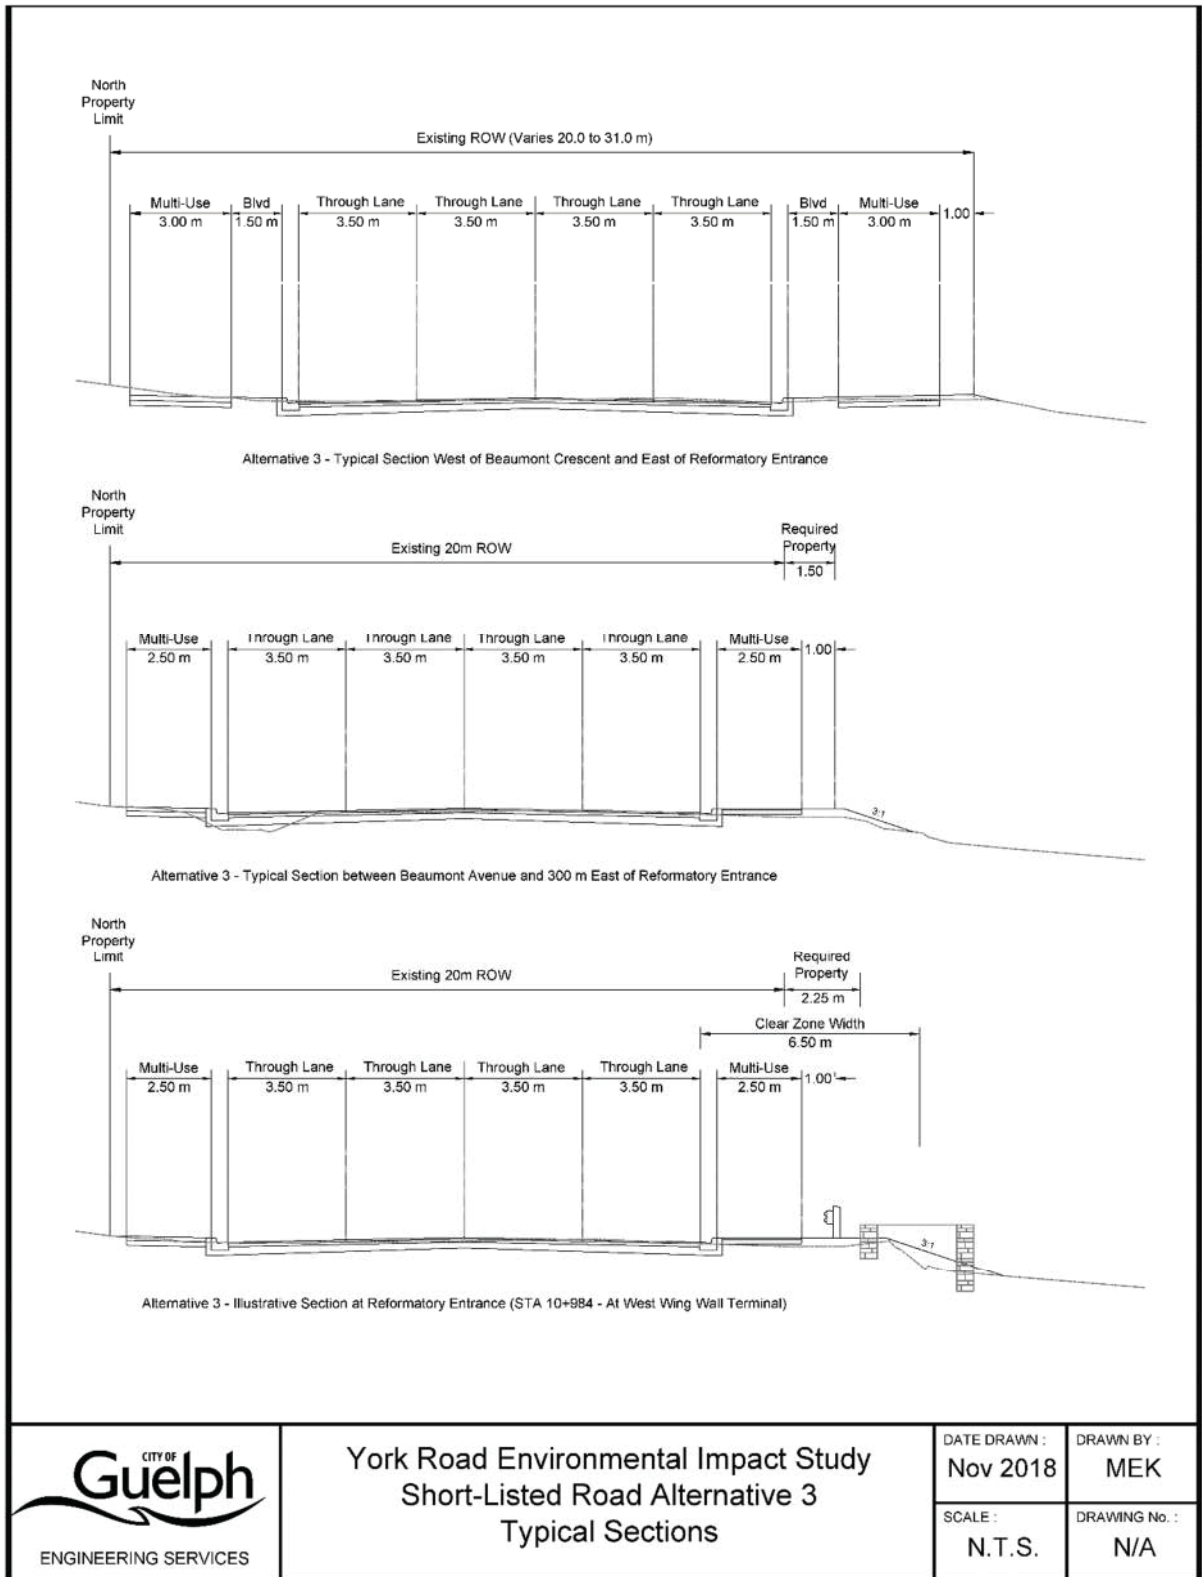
Typical Roadway Cross-Section for York Road Alternative 3.
